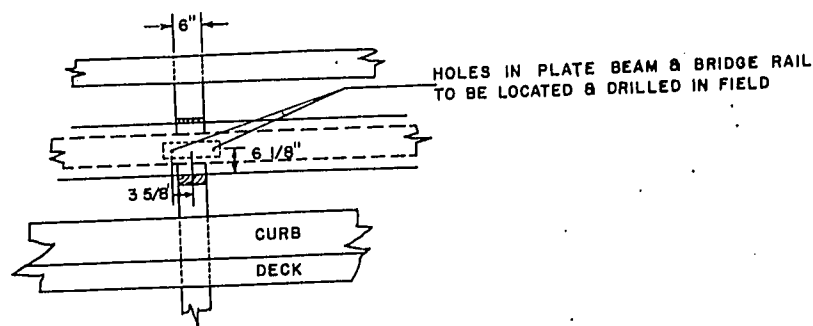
DETAIL FOR ATTACHING BEAM GUARD TO STRUCTURES FROM EXIST. BEAM GUARD
